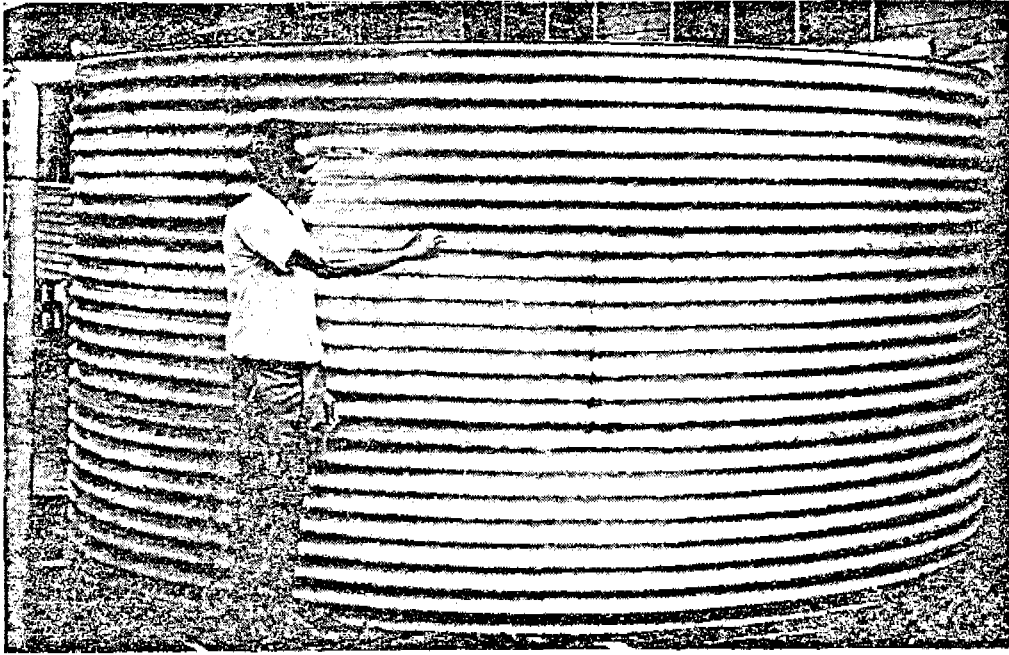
Corrugated galvanised iron tank showing rivet-and-solder join between sheets
